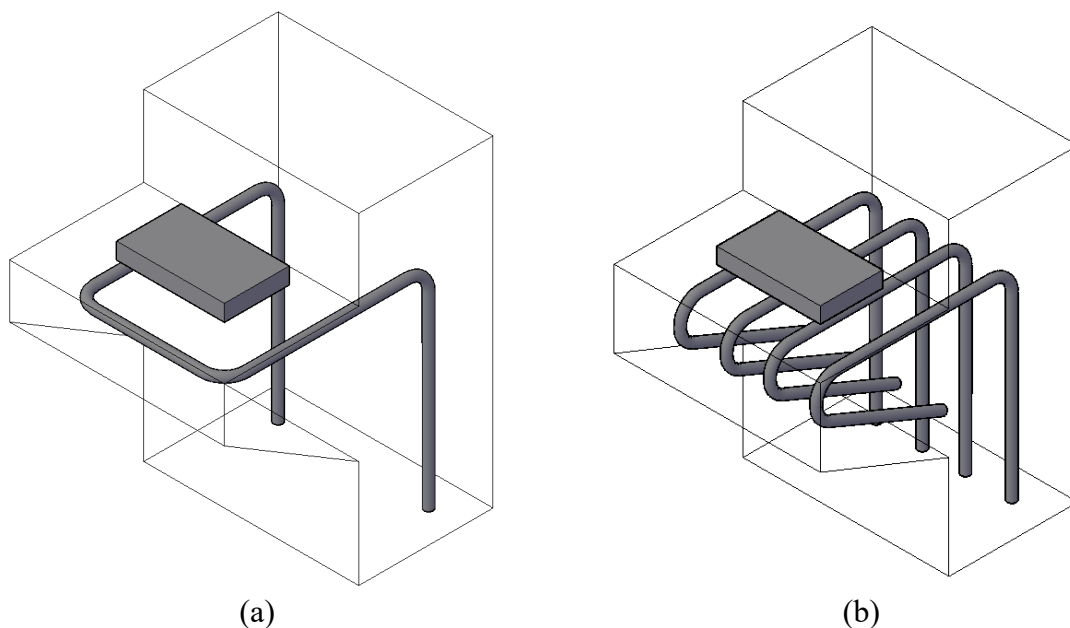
Possible reinforcement configuration of out-of-plane anchorage (a) and in-plane anchorage (b) of tensile reinforcement in a corbel.
